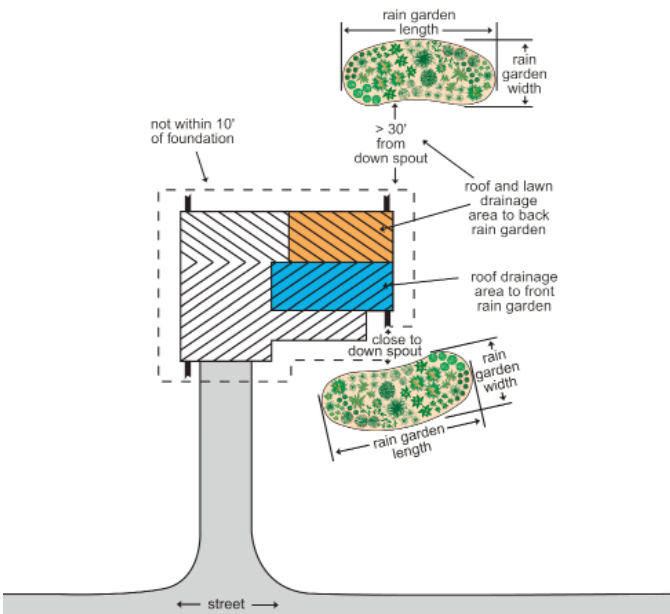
Residential rain gardens can be placed in the front or back yard. Crescent, kidney, and teardrop shapes work well.
